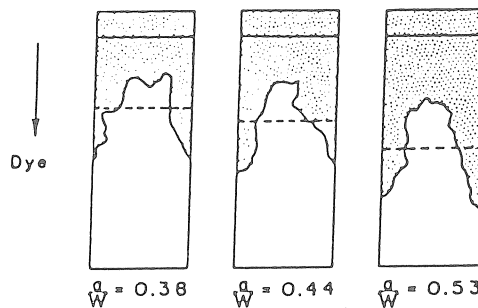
Non-uniform crack fronts in plain concrete beams, after [15].
